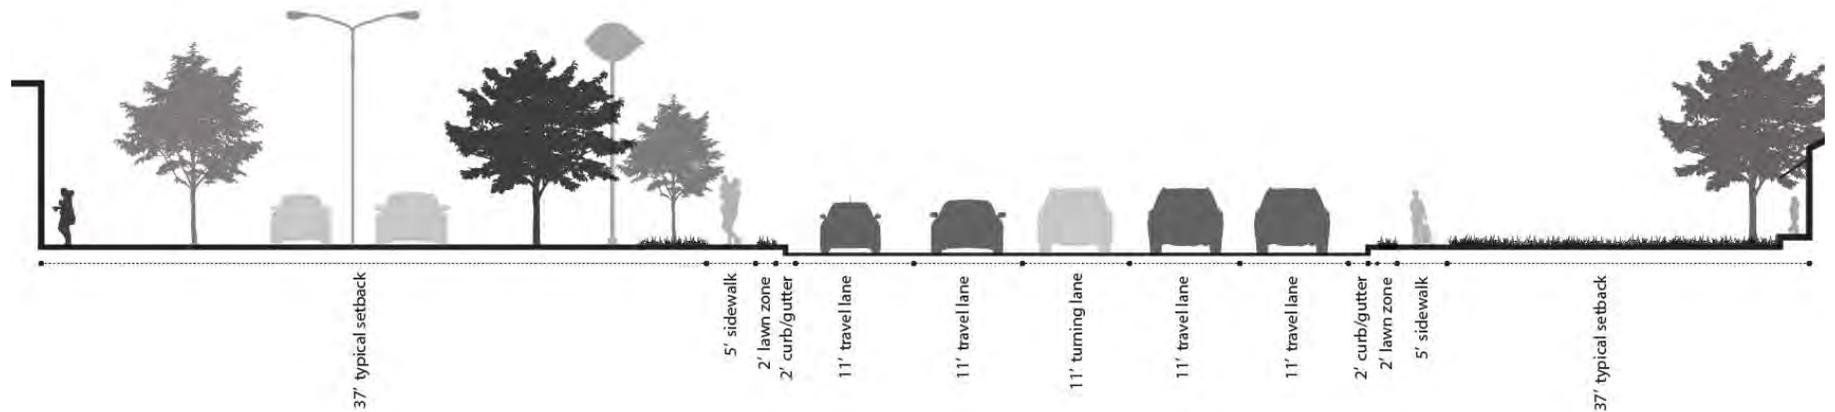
Typical five-lane cross section for East Main Street between Bowman Avenue and Kansas Avenue
